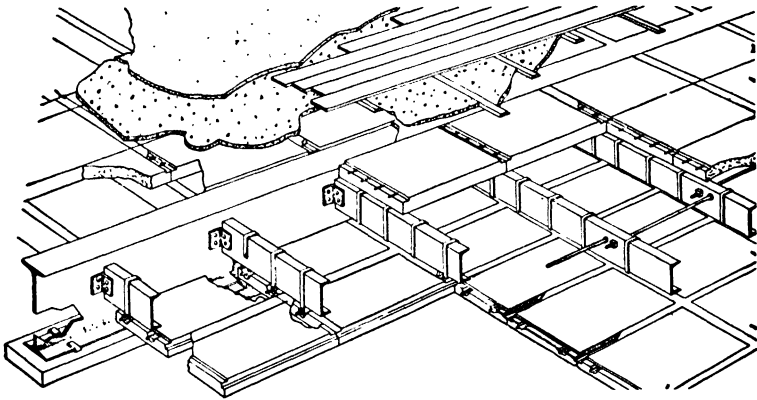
Precast Gypsum Slabs for Steel Frames.
